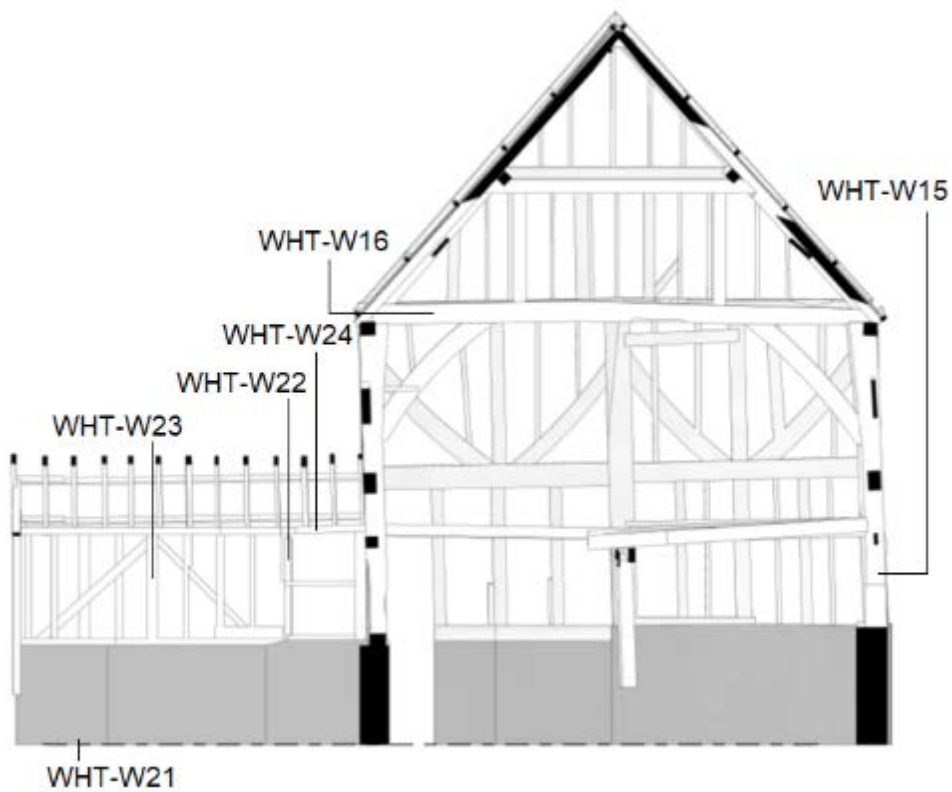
Section through Truss 6, east face, showing the sampled timbers, WHT-W15-16, and WHT-W22-24 (after ATD London Ltd)
